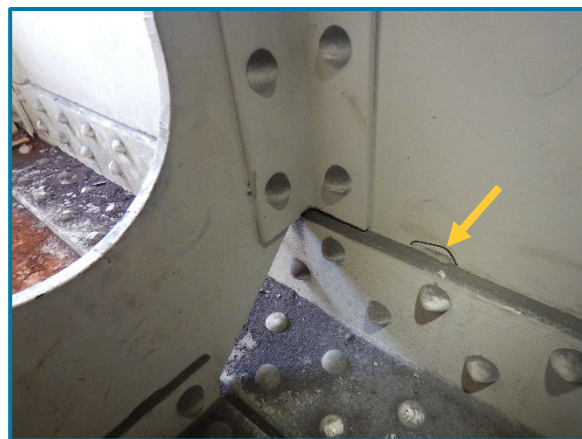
Typical tack weld between the north web plate and bottom flange angle on the east side of both fascia girders and at every transverse stiffener angle between the west bearing and Girder F (looking northwest on the inside of Pier Cap 7A).
